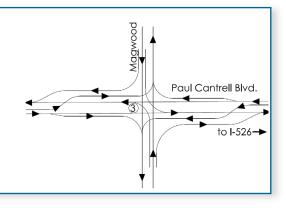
Paul Cantrell Boulevard at Magwood Drive Alternative 7
